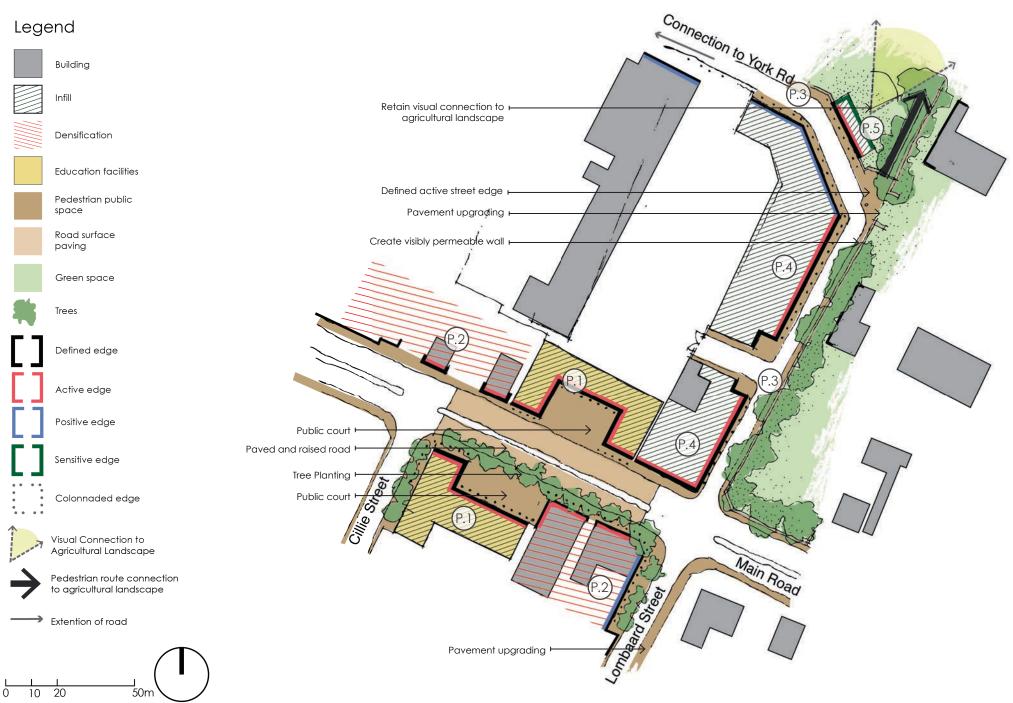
MAIN ROAD INFILL : PRECINCT
